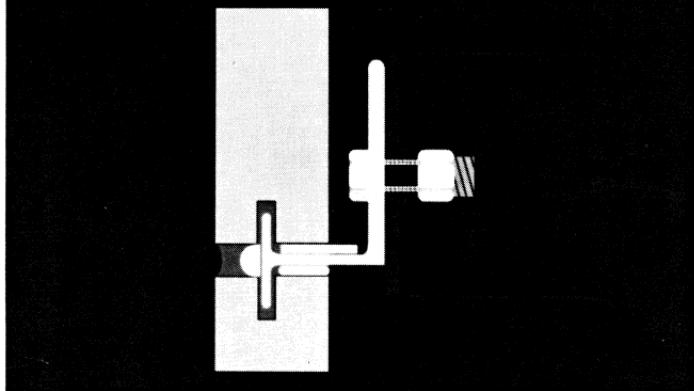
Final kerf connection detail used for recladding of Amoco building.
